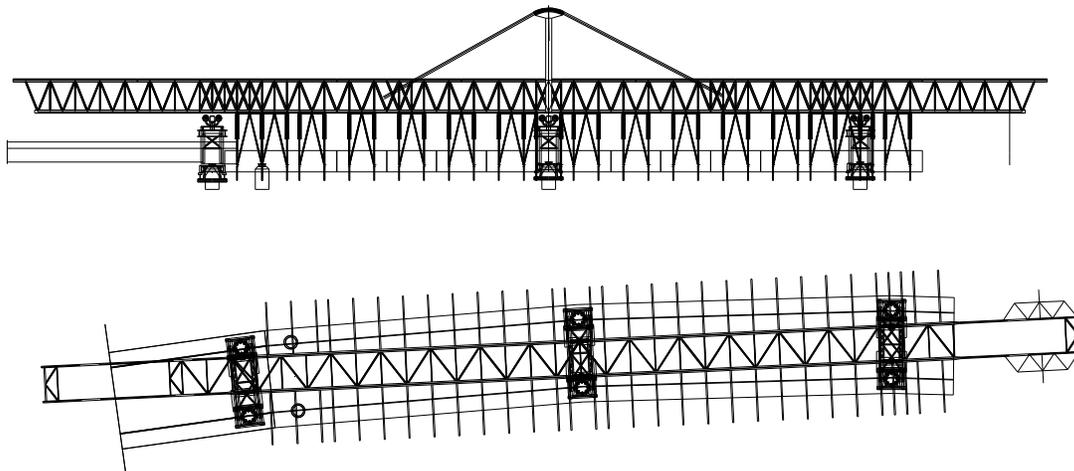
Elevation and plan view of double span construction movable scaffolding system
